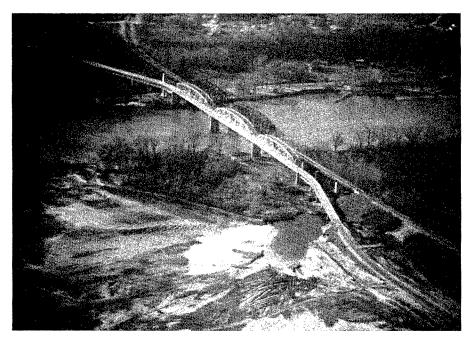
Aerial view, looking northwest, of U.S. Highway 159 bridge embankment on Missouri River floodplain, near Rulo, Nebraska. (Flow from right to left).
